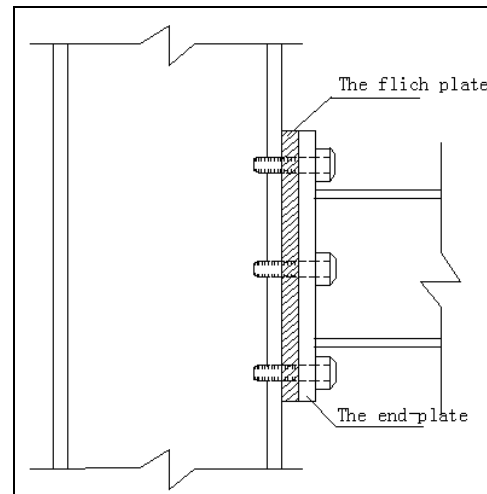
Connection between rectangular steel tube column and H shape steel beam
